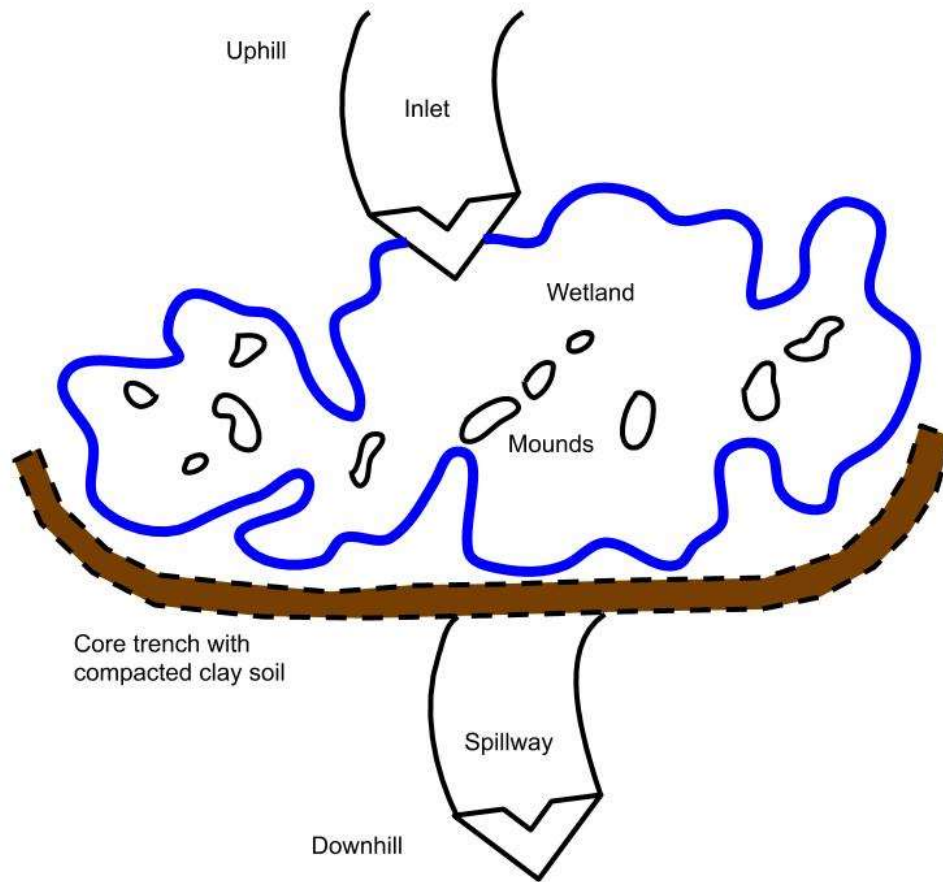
Wetland restored from drainage ditch or borrow pit ditch (typical plan view).
